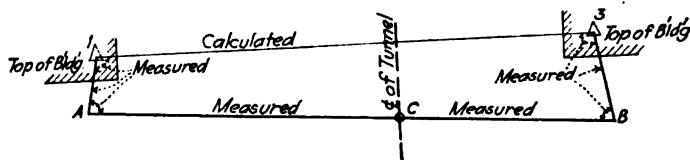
Method used when the triangulation stations are on the roofs of buildings.
